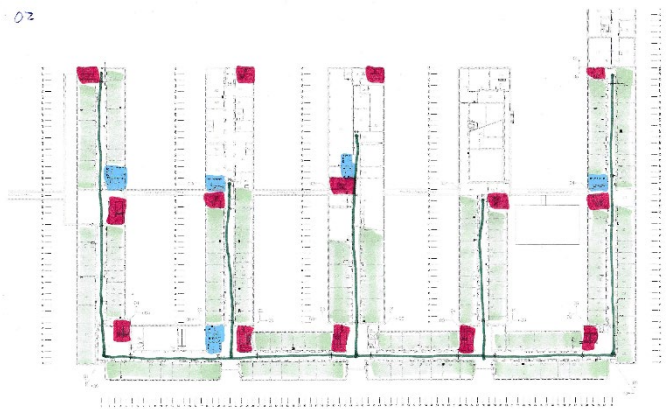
Third floor (Red: Stairwells, Blue: Toilets, Green: Repetitive office structure)
